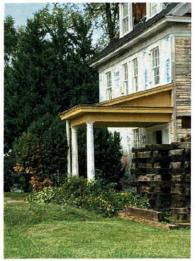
Shows inadequate structural supports, and inadequate protection from the elements)
